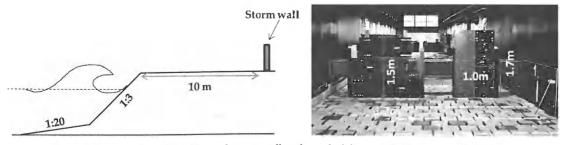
Cross section of the dike and storm wall at the end of the crest (left), storm walls (right)
